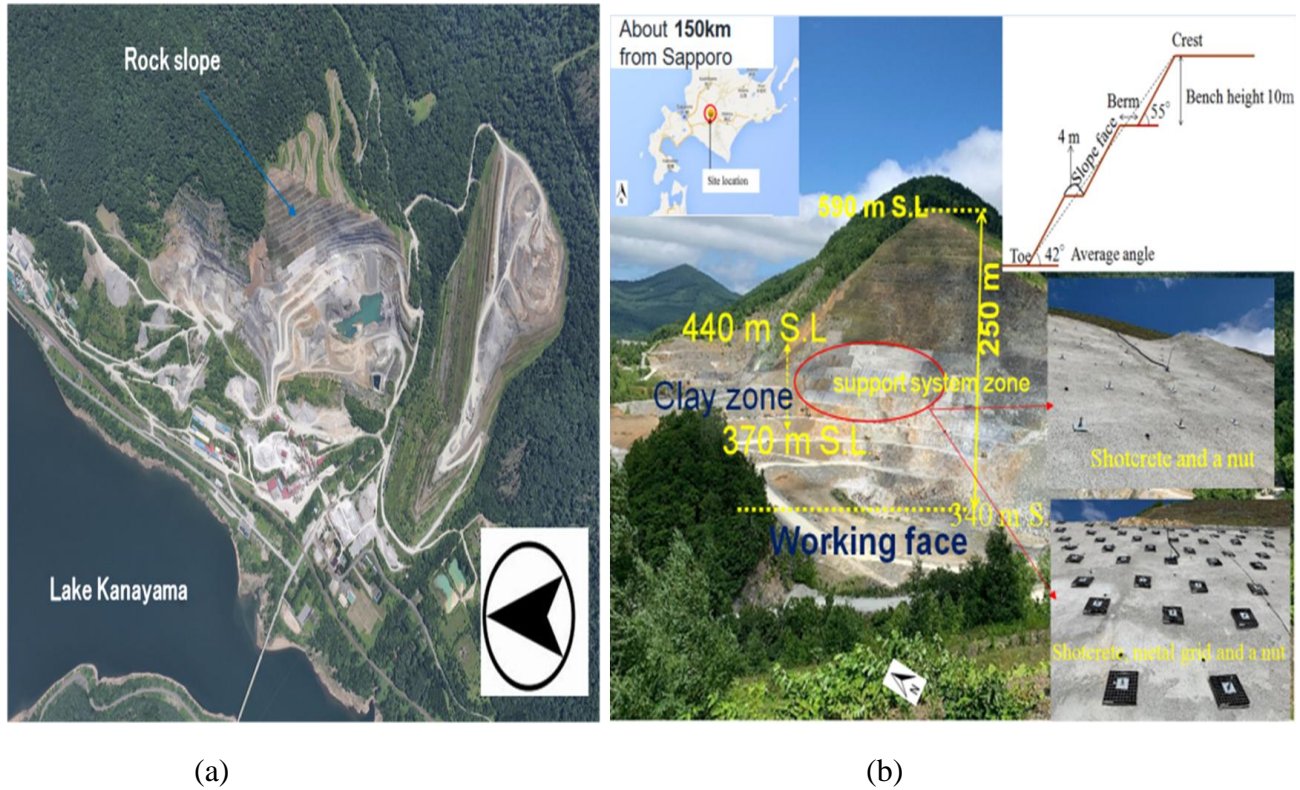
Plane view of the mining area (a) and the rock slope layout (b) at Higashi Shikagoe quarry.
